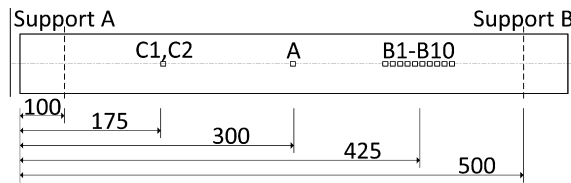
Schematic of strain gauge layout on beam (dimensions in mm).
